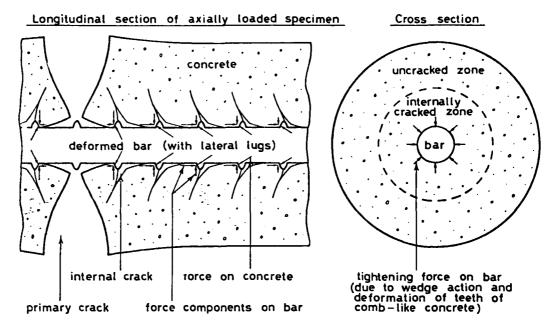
Deformation of concrete around reinforcing steel after formation of internal cracks (schematic diagram)
